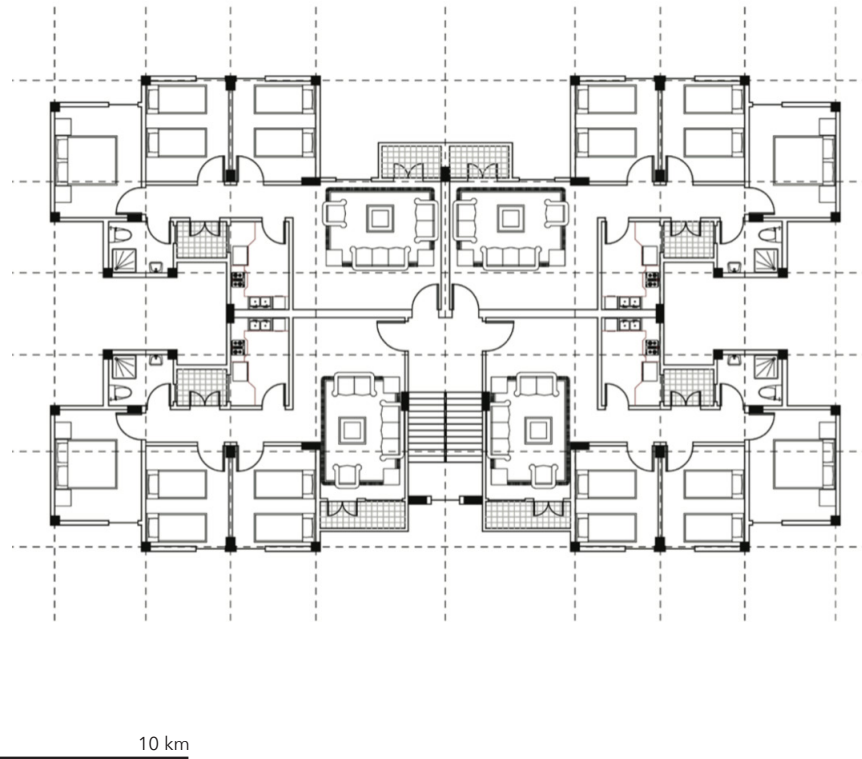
Floorplan of the typical Social Housing units around Egypt. Drawing by Author
